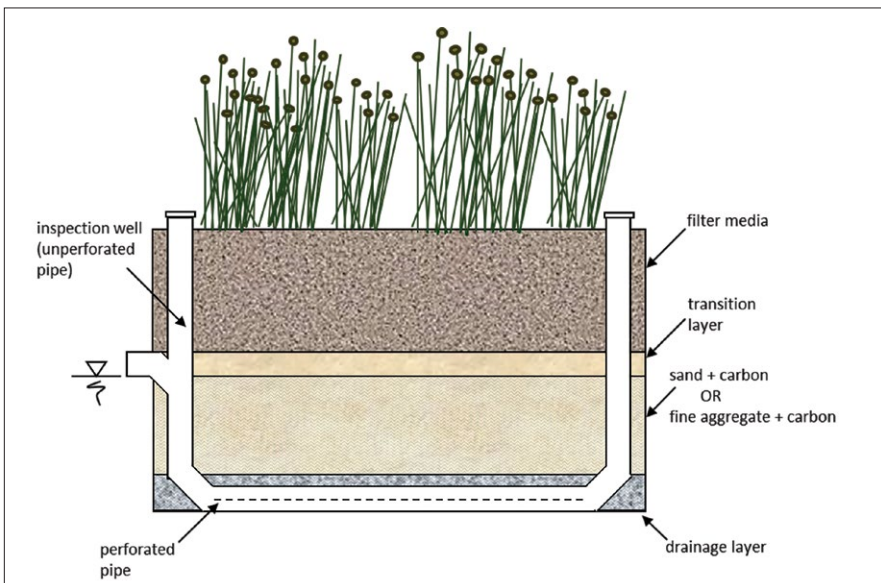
Long section of a biofilter with a submerged zone showing collection pipe and riser outlet (Note that, in this system, the transition layer is between the filter media and submerged zone). Note series of 45° elbows rather than 90° elbows, to facilitate entry of maintenance equipment (e.g. pipe snake or water jet)
